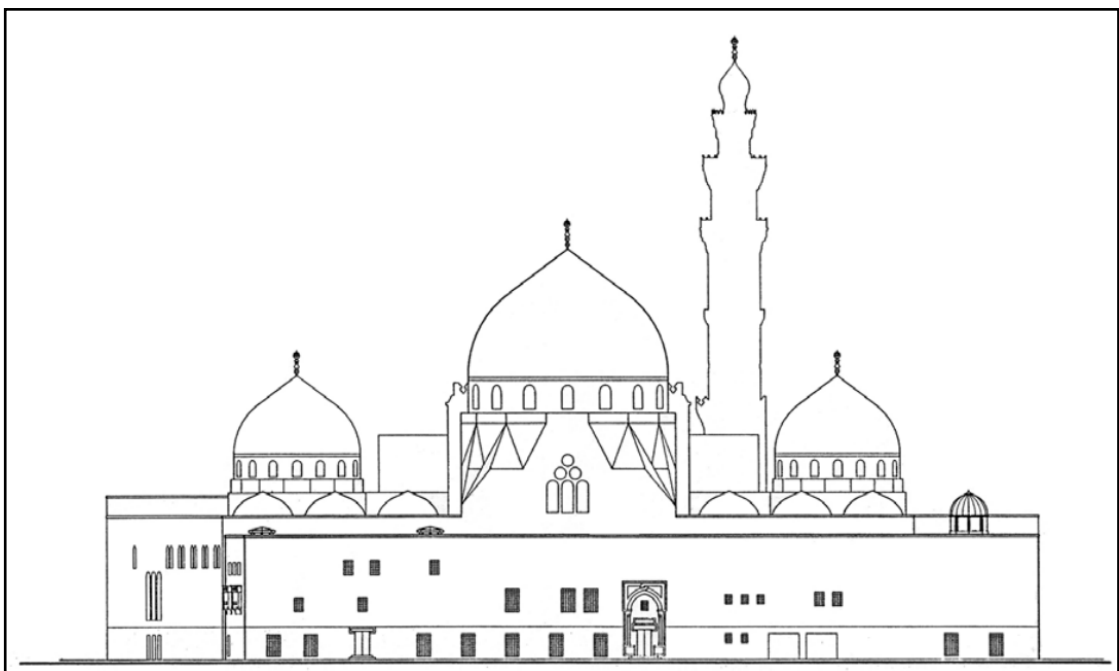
King Saud Mosque: East Elevation (El-Wakil, 1988).
